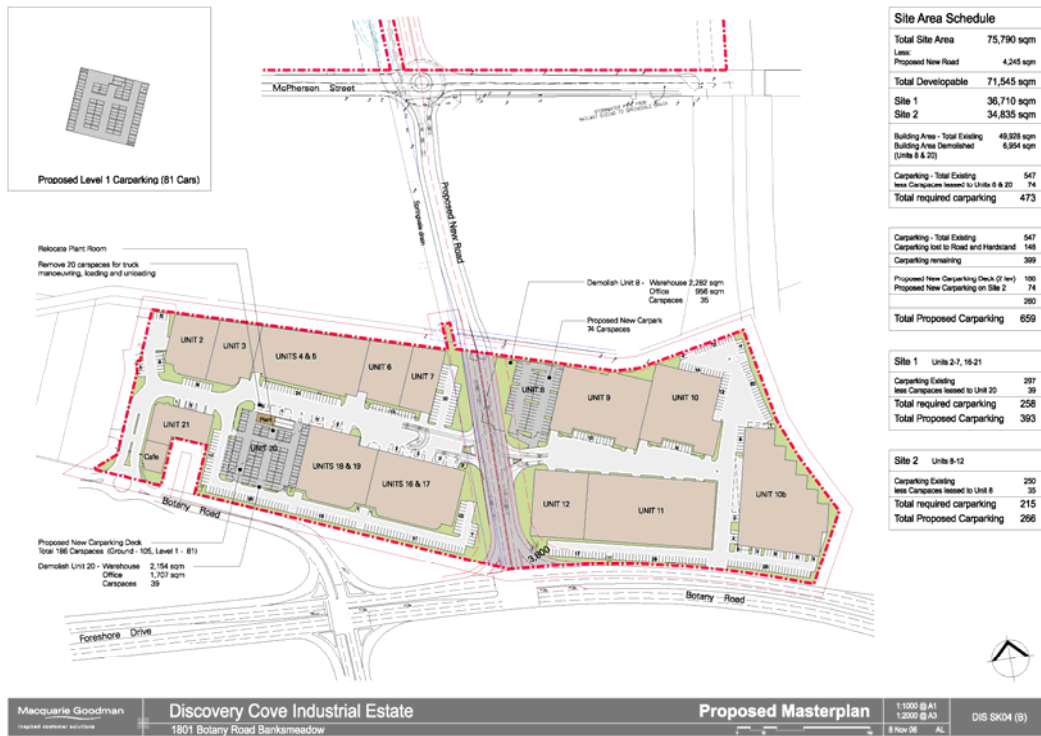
Proposed Future Road Alignment and Revised Layout of Discovery Cove Industrial Estate
